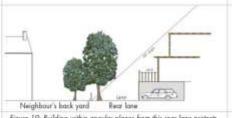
Building within angular planes from this rear lane protects existing neighbour's back yard privacy and access to sunlight.
